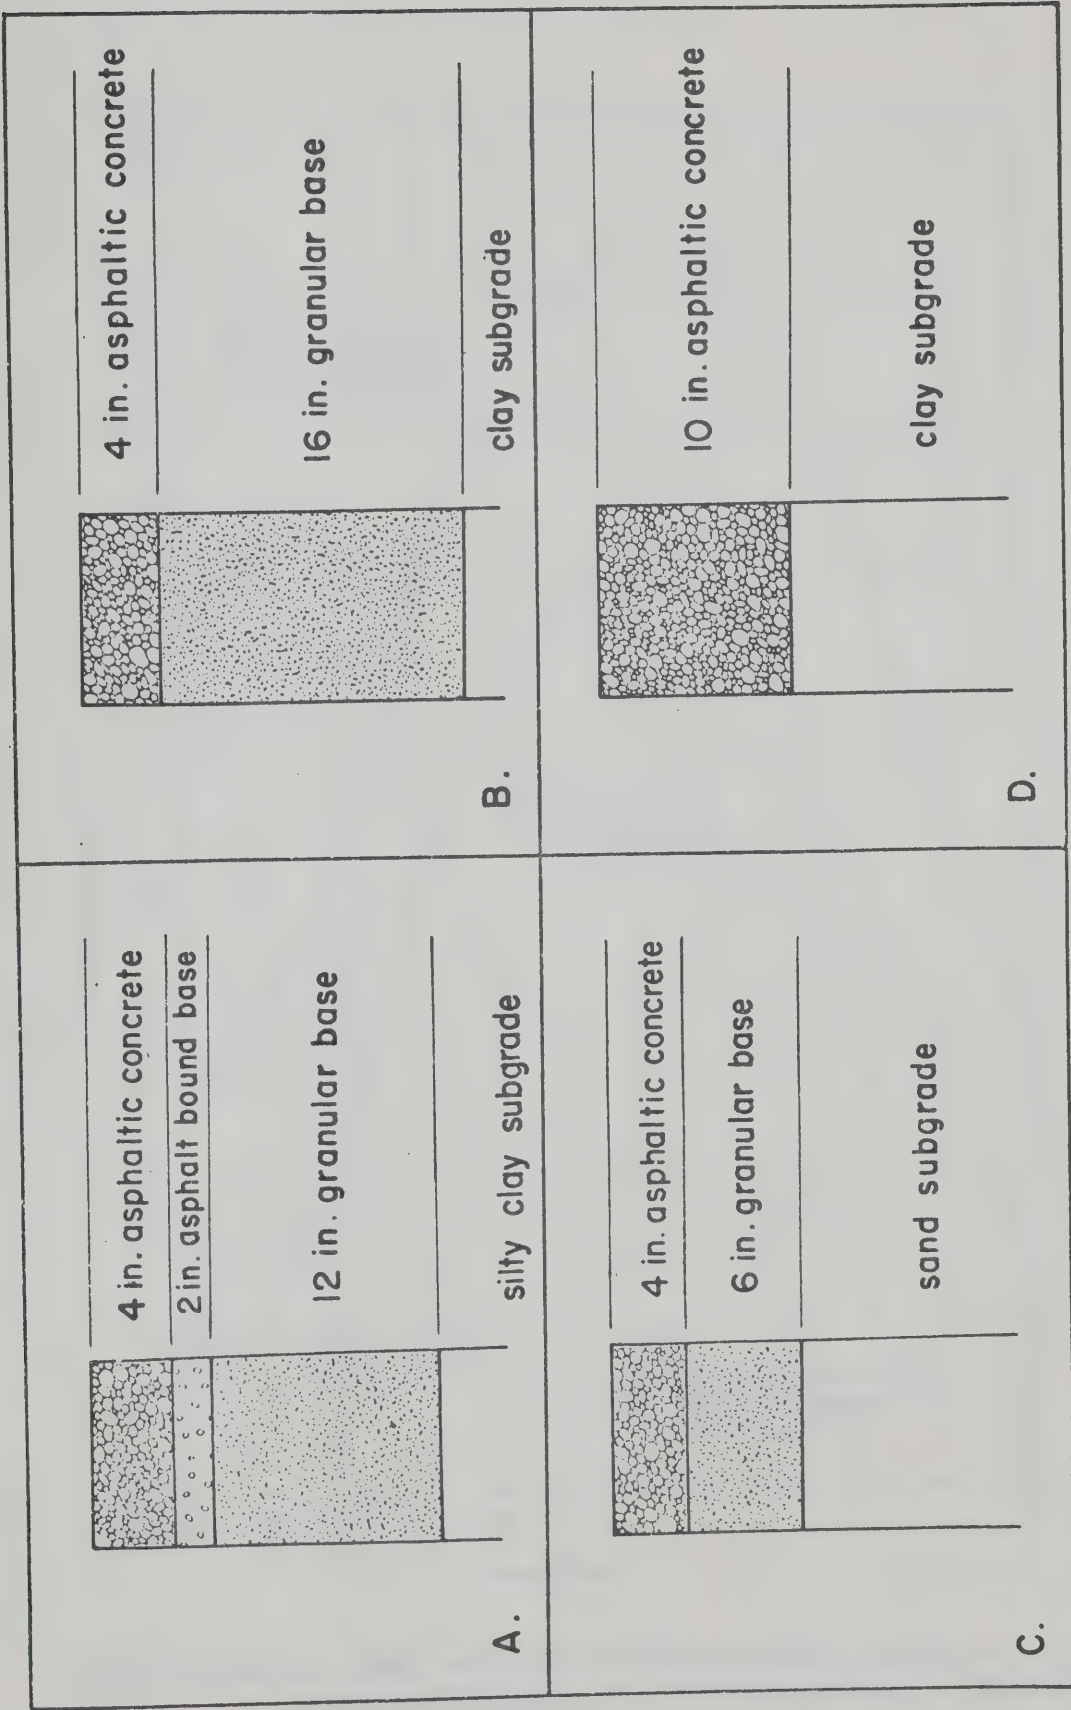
ASPHALTIC CONCRETE PAVEMENT STRUCTURES.
